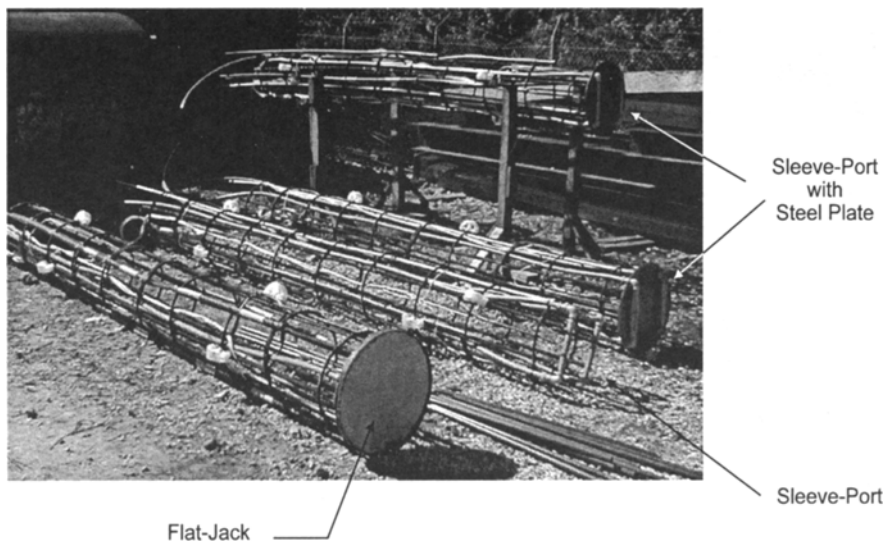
Reinforcing Cages Complete with Instrumentation and Grouting Apparatus.
